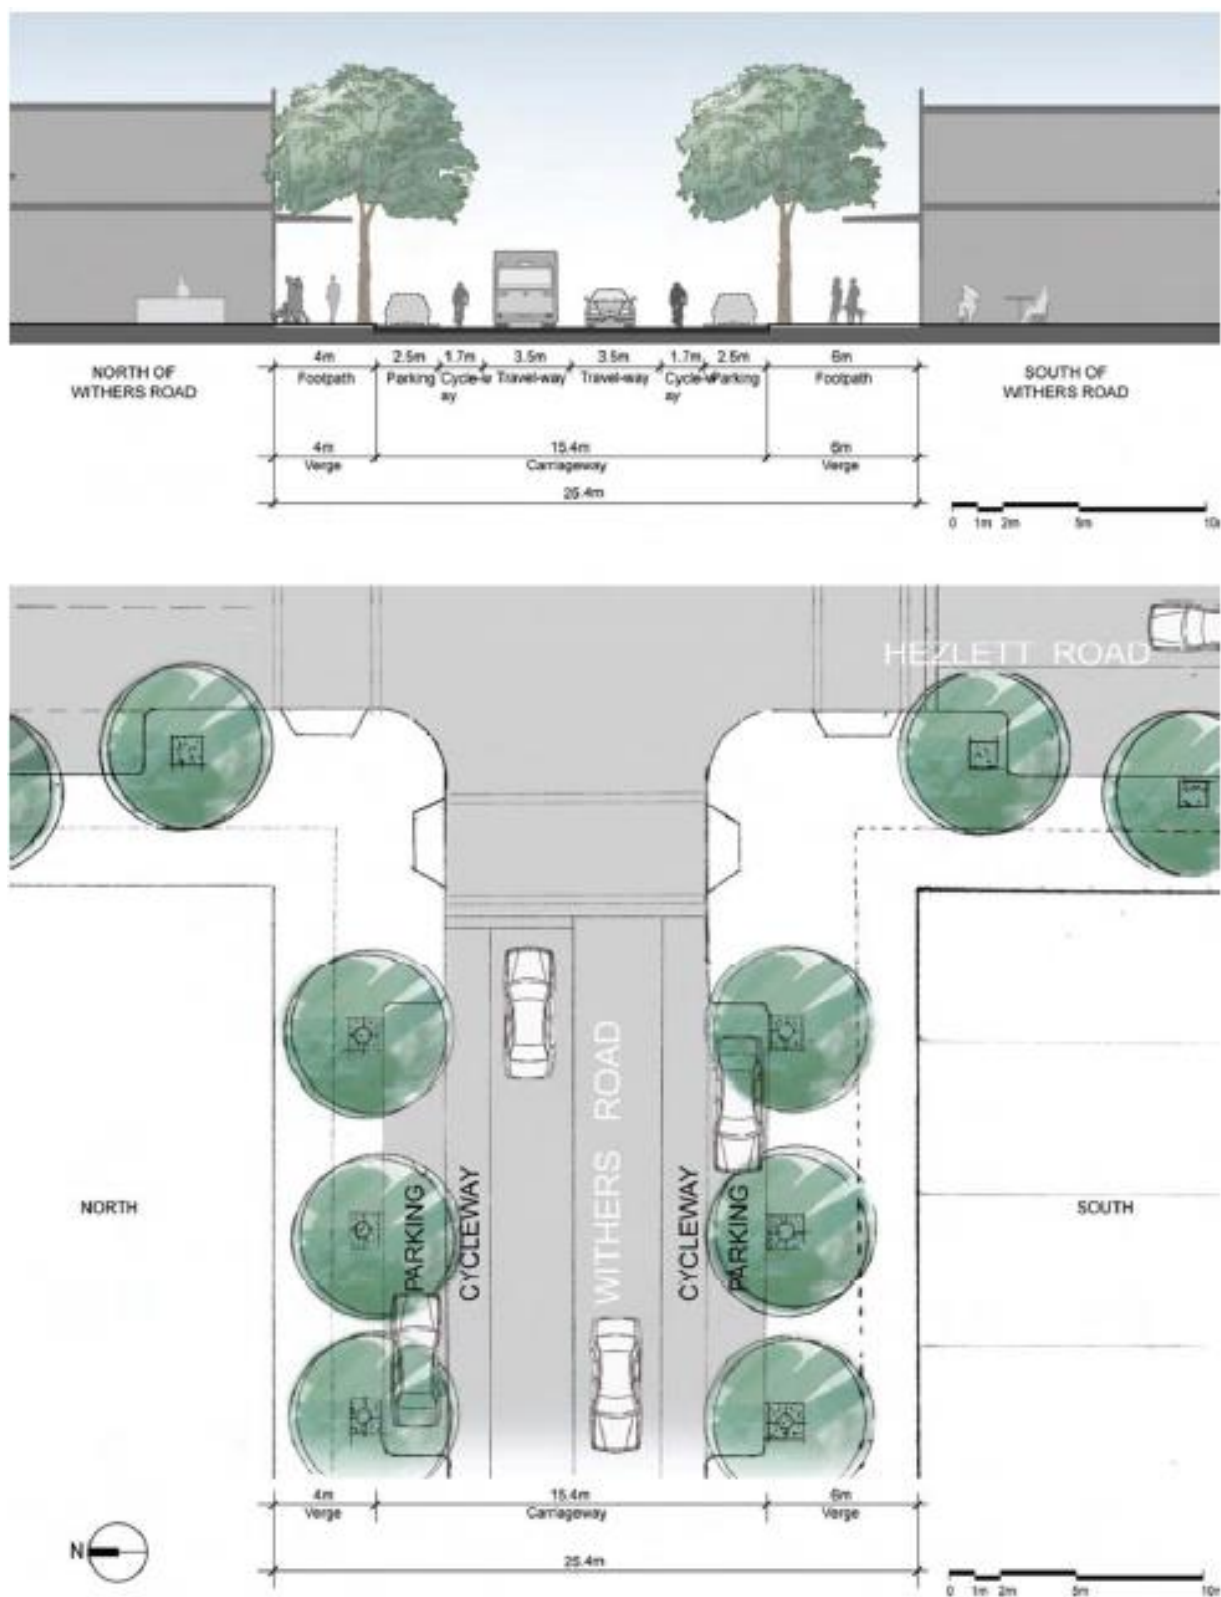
Town Centre Street - Withers Road (between Barry Road and Hezlett Road)
